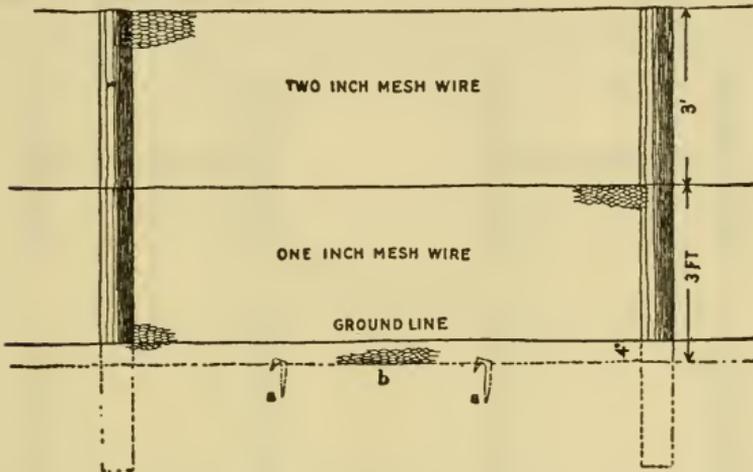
A common type of fence construction. *a*, Manner of anchoring wire under ground; *b*, wire buried a few inches under ground.
